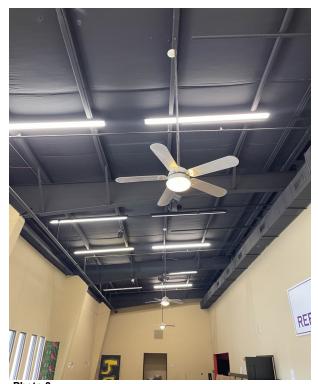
Comments: Lobby Ceiling and Light Fixtures
